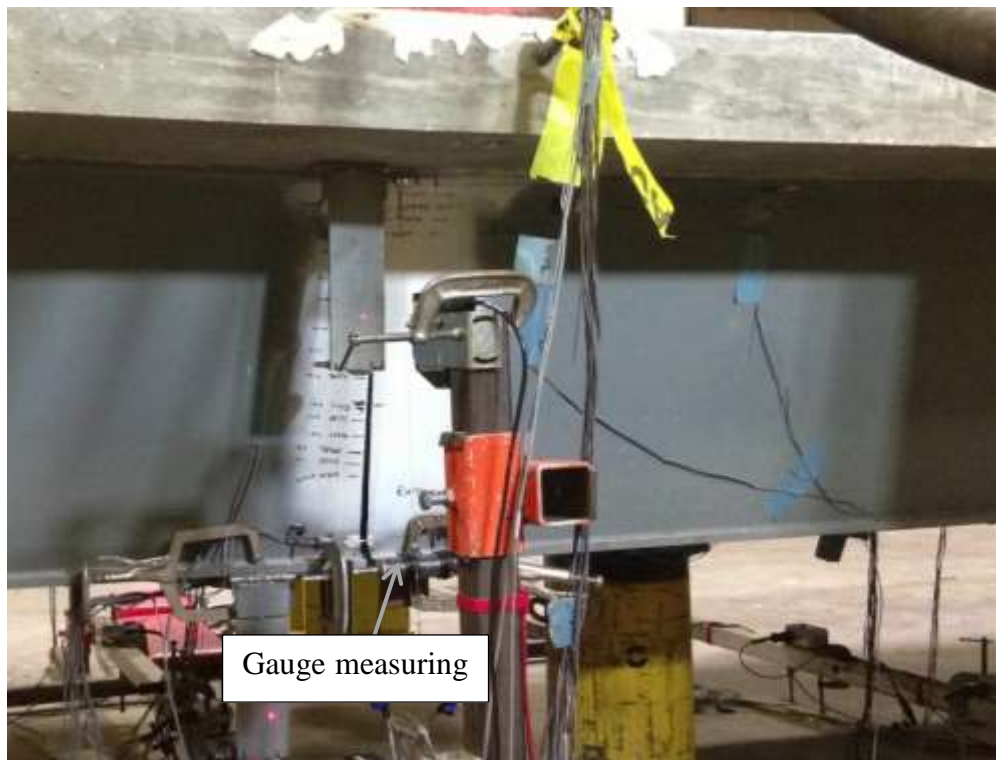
Crack growth in the damaged girder.
